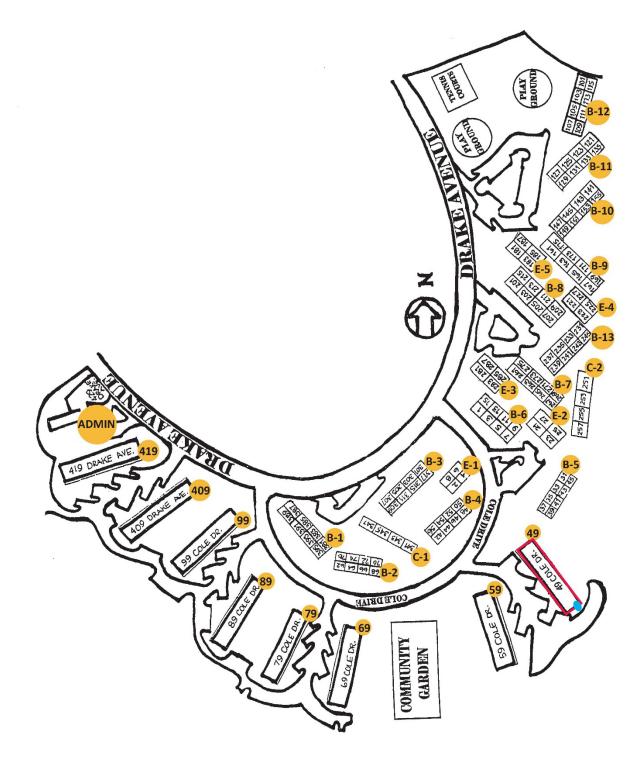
A site plan illustration of Golden Gate Village. Building 49 is outlined in red. The location of the French Drain installation is indicated by the blue dot which is not to scale. North is up, Highway 101 is to the east; map not to scale. Courtesy: Marin Housing Authority, with illustration by ICF.
